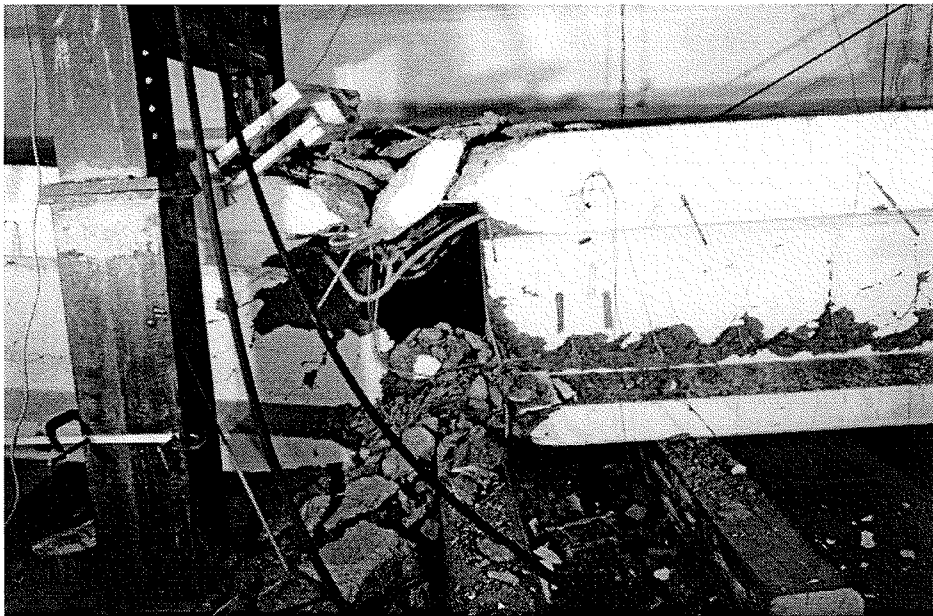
Heavily Damaged Region – Girder II at Load Point D
